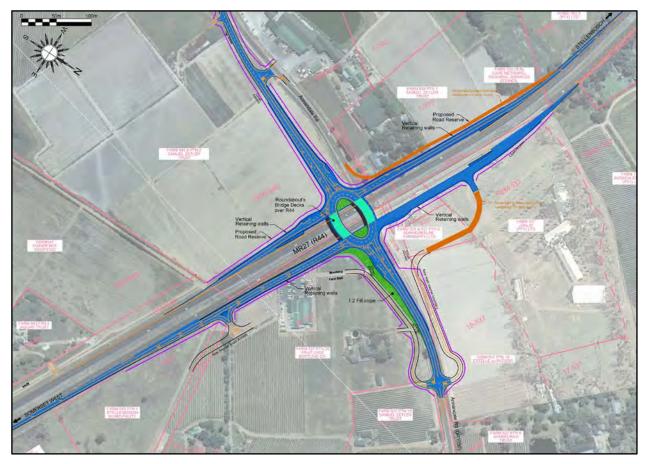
Proposed grade-separated roundabout at the Annandale Road Intersection with vertical retaining walls (K&T, September 2015)
